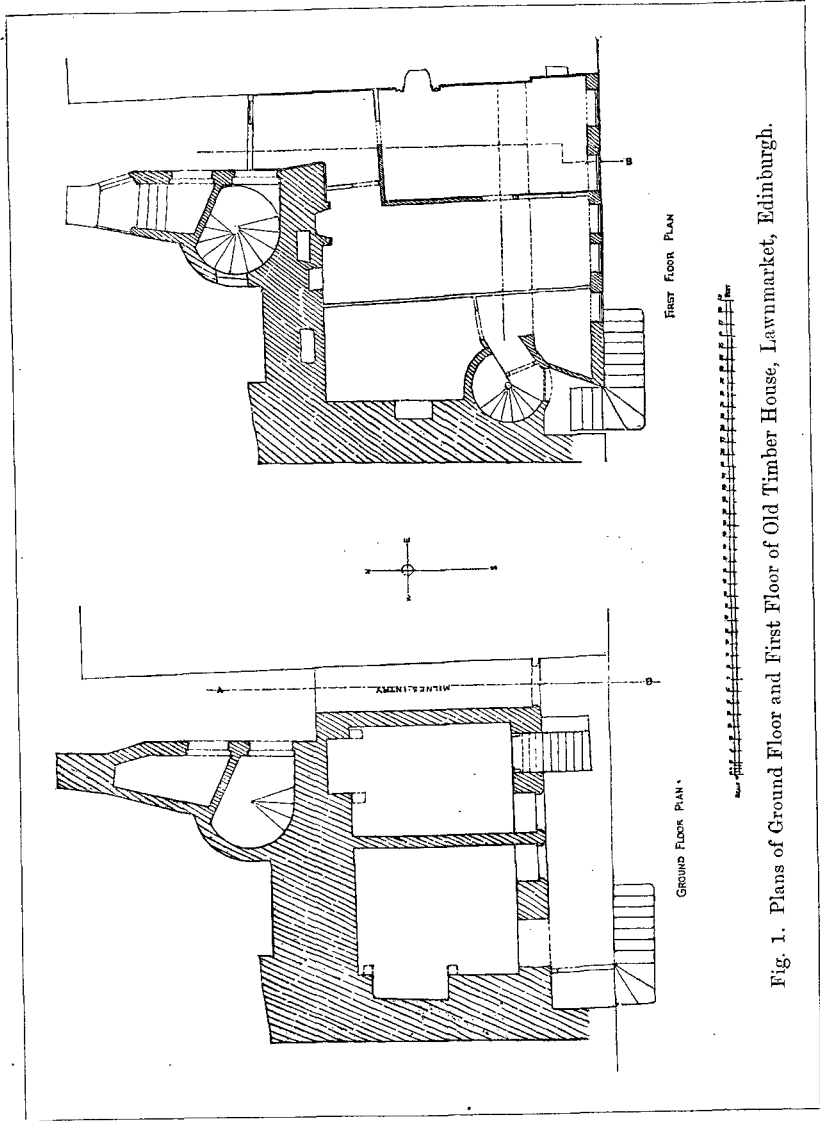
Plans of Ground Floor and First Floor of Old Timber House, Lawnmarket, Edinburgh.
